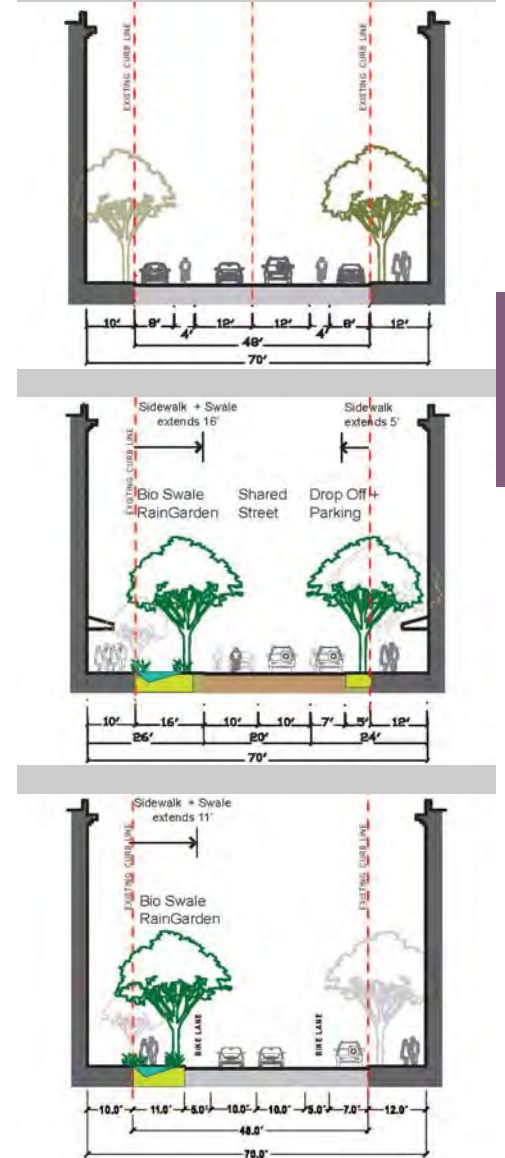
Center Street Greenway (Milvia to Shattuck). A landscaped "greenway" would create a landscaped connection between the UC campus and Civic Center Park. Existing conditions depicted at top. See Table d.1 for a description of alternatives depicted above.
